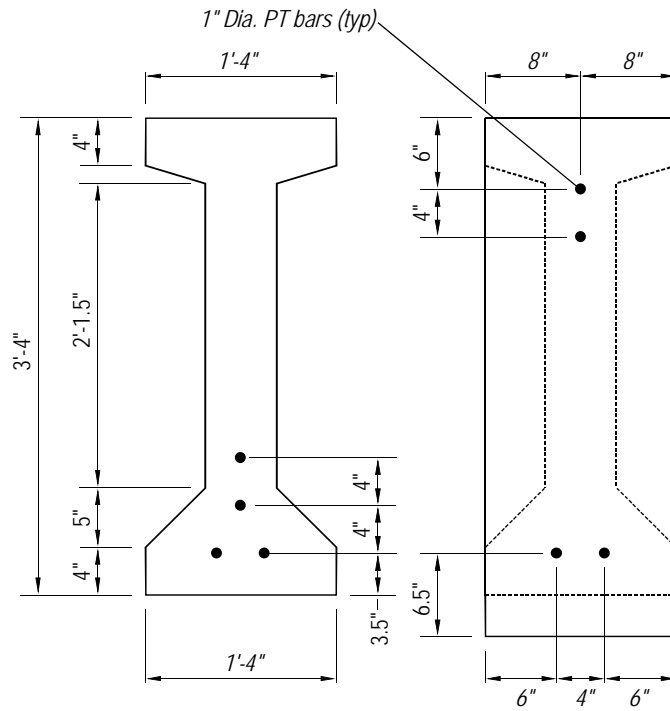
Cross section and post-tensioning bars details at midspan (left) and end.
